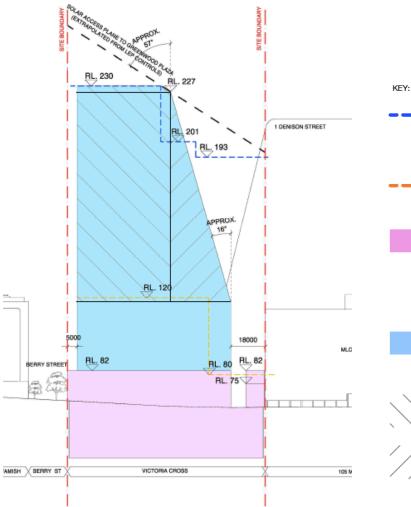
Amended proposed building envelope: Miller Street elevation Source: Sydney Metro
